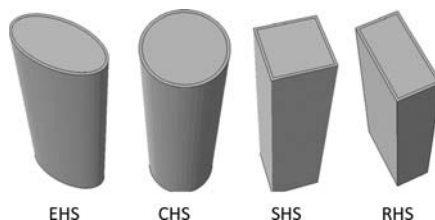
Typical shapes of selected concrete filled steel tubular stub columns.
